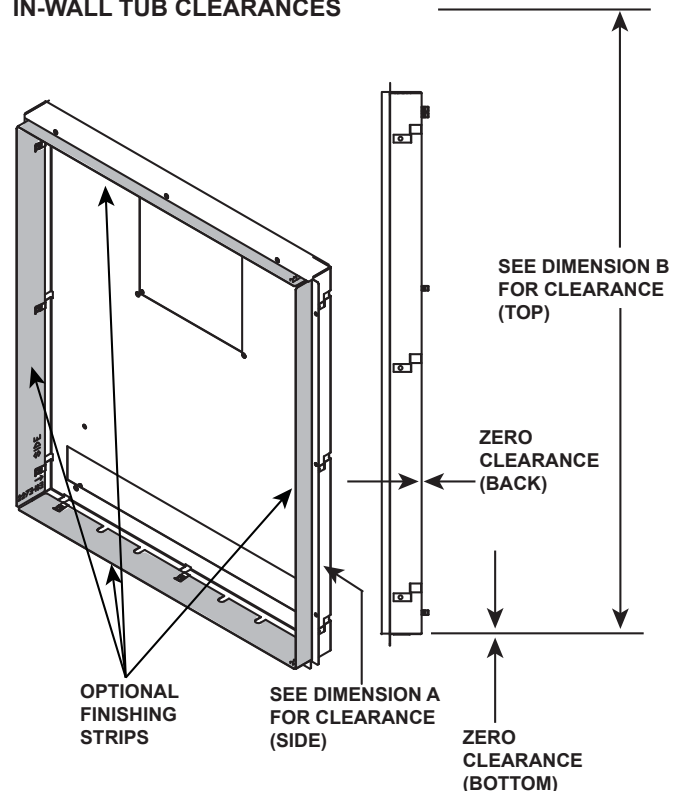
Framing Dimensions and In-Wall Tub - Clearances
